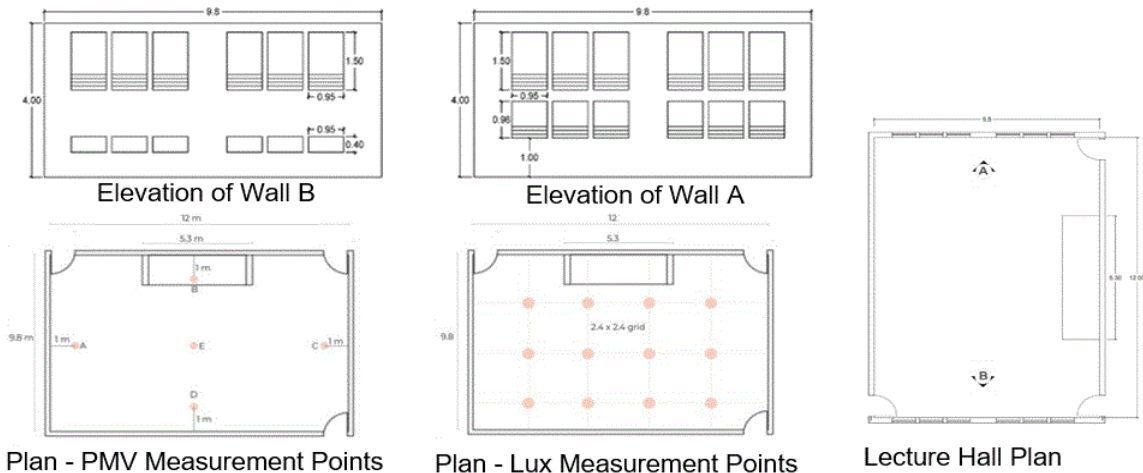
Plan and Elevations of the lecture halls and plans showing PMV and Lux measurement points.
